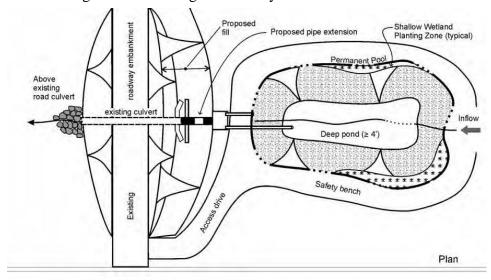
Constructed Stormwater Wetlands – Plan Source: Virginia Stormwater Management Handbook
